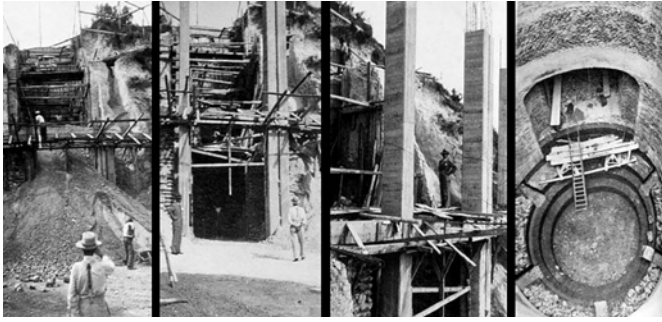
Excavation work for the construction of the reinforced concrete structure of Villa Girasole. (Image source: Galfetti A, Frampton K, Farinati V, Villa Girasole. La casa rotante – The revolving house, Mendrisio Academy Press, 2006).
